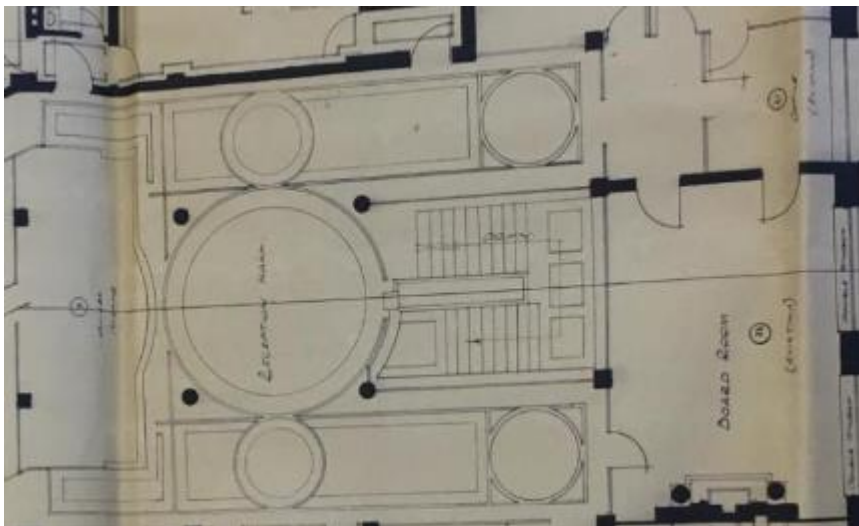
1939 First floor ground plan. Note 'cashiers desk' to the left of the reception hall, suggesting this hall was not enclosed from the full expanse of the office floor to the left.
